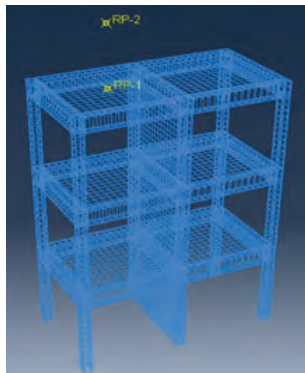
Reinforcement Detailing of a RC blast load at 2m from the top of the building
